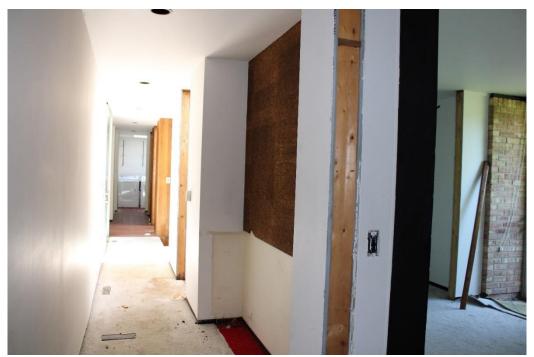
Hallway looking southwest from bedroom wing toward laundry room at its terminus.
